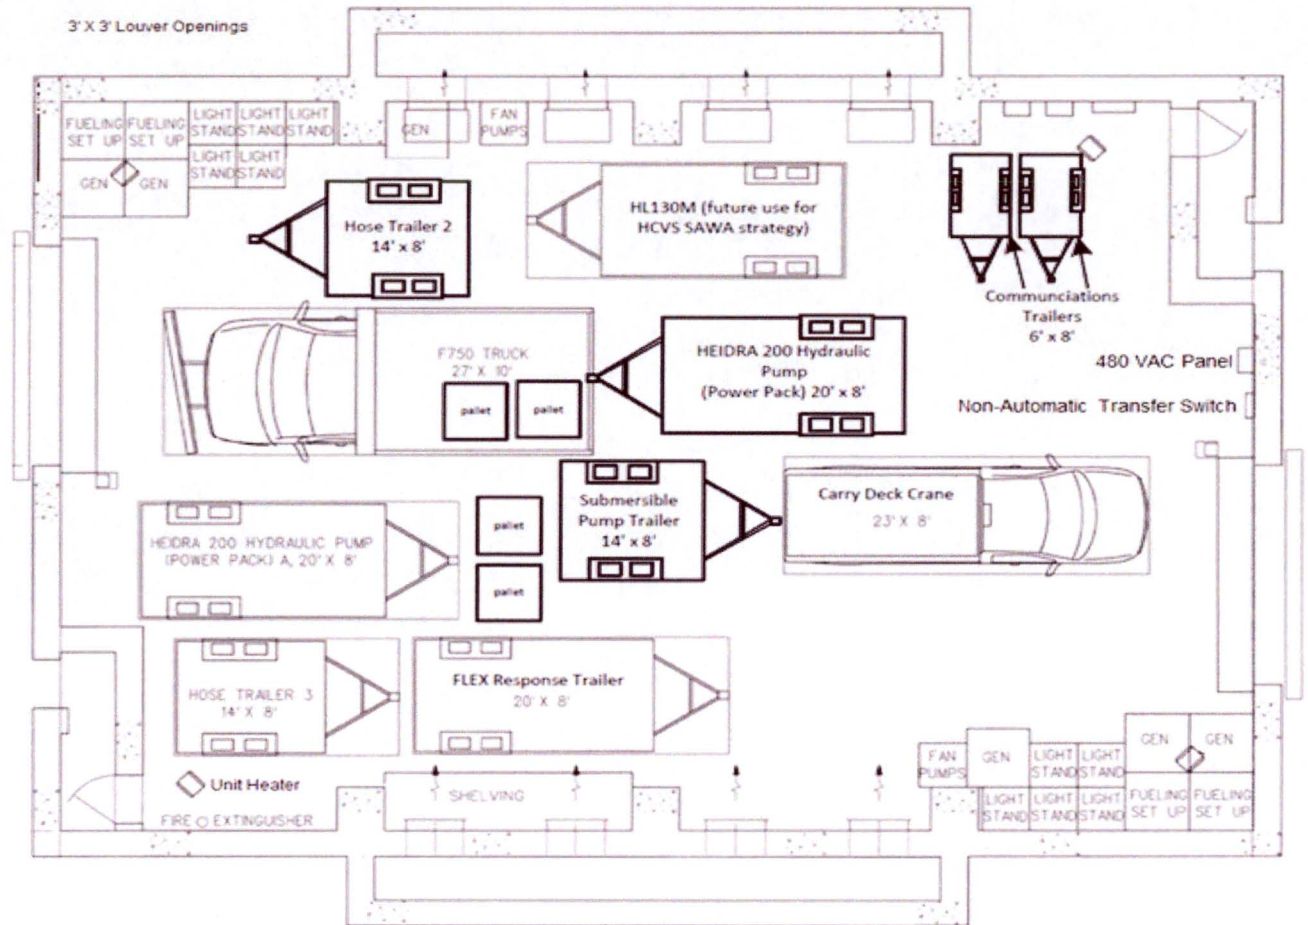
FLEX Building B Robust Enclosure Typical Layout
